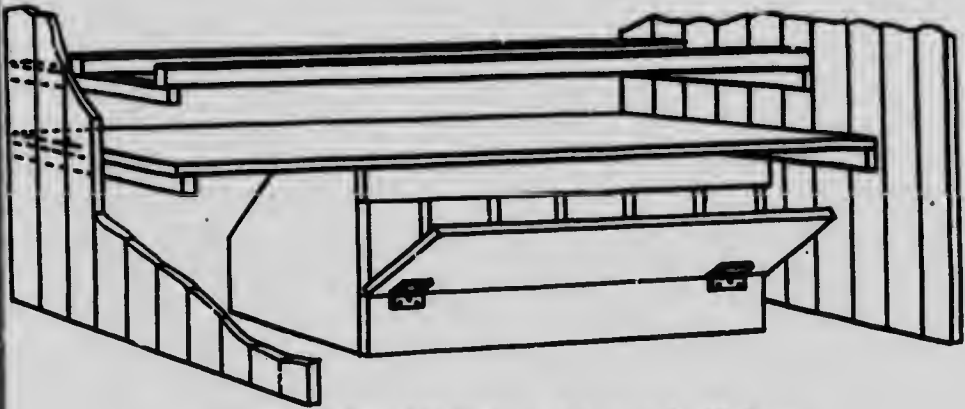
INTERIOR FIXTURES SHOWING HOW ROOSTS, NESTS, AND DROP-BOARDS SHOULD BE CONSTRUCTED IN ORDER THAT THEY MAY BE EASILY REMOVED.
